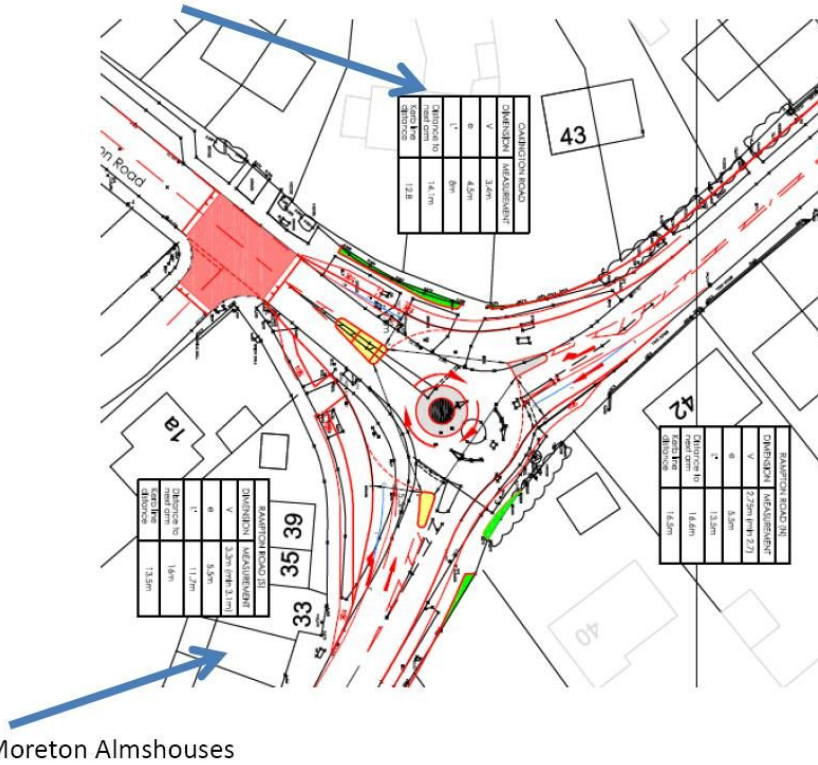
Proposed “improvement” to Oakington Road / Rampton Road roundabout
